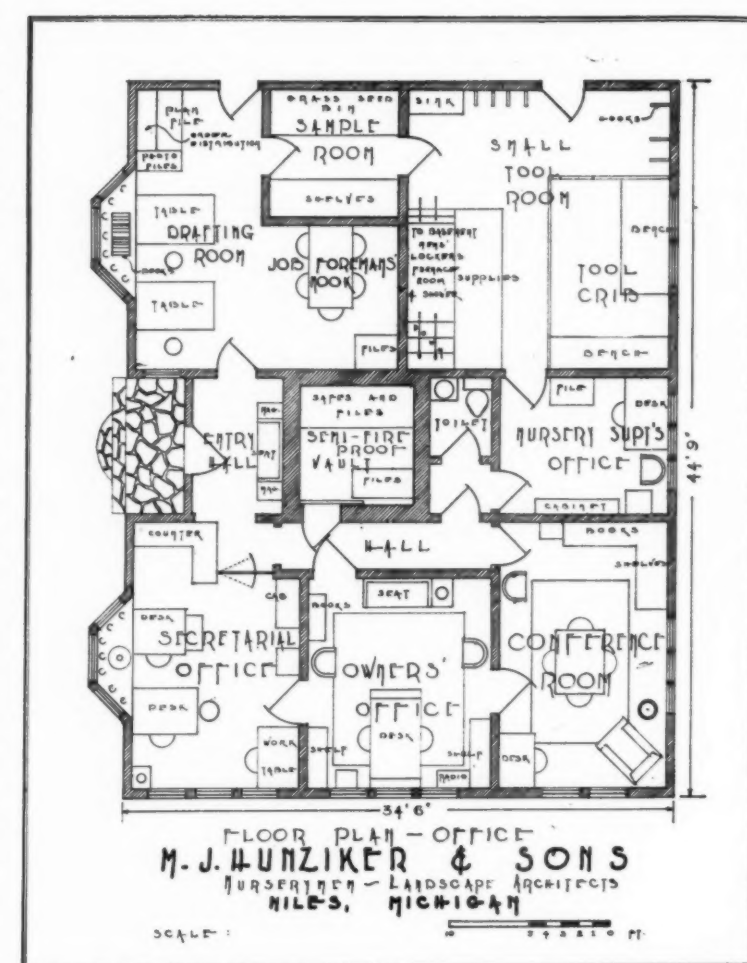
Ground floor plan of office building as originally constructed. See text and general plan (Figure 28) for proposed changes.
